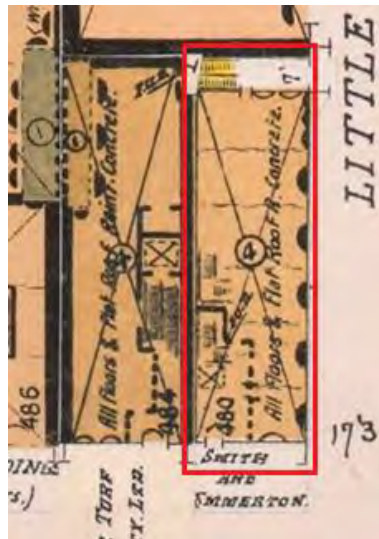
Detail from a 1925 Mahlstedt plan show a four-storey office building occupied by Smith and Emmerton. (Source: Mahlstedt Map Section 1, no 16, 1925)
